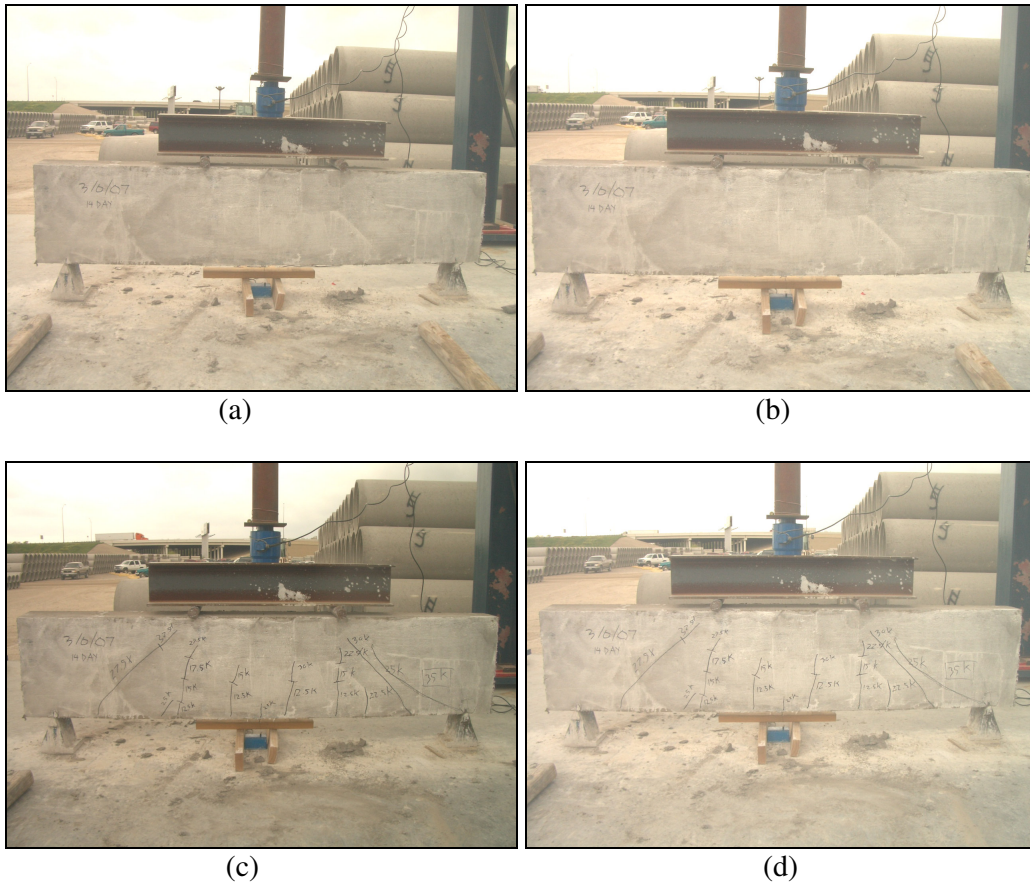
Ductile lightweight concrete beam with reinforcement cast on 3/6/07 for 14 day test; (a) before test, (b), (c) and (d) cracks on the beam after test
